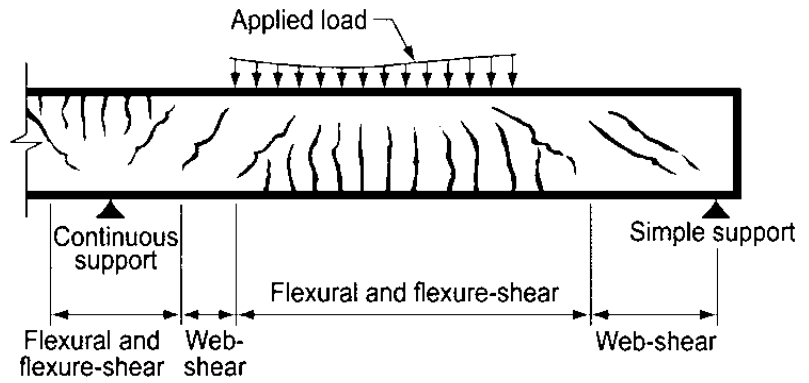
Types of cracking in concrete beams.
